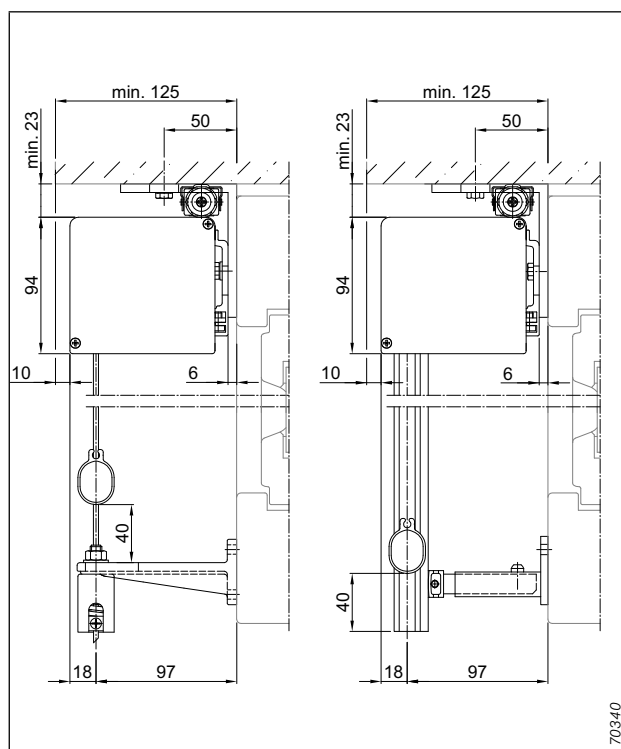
Right rolling blind (also available as left rolling blind), ceiling installation, guide rail, with cable exit at the back
